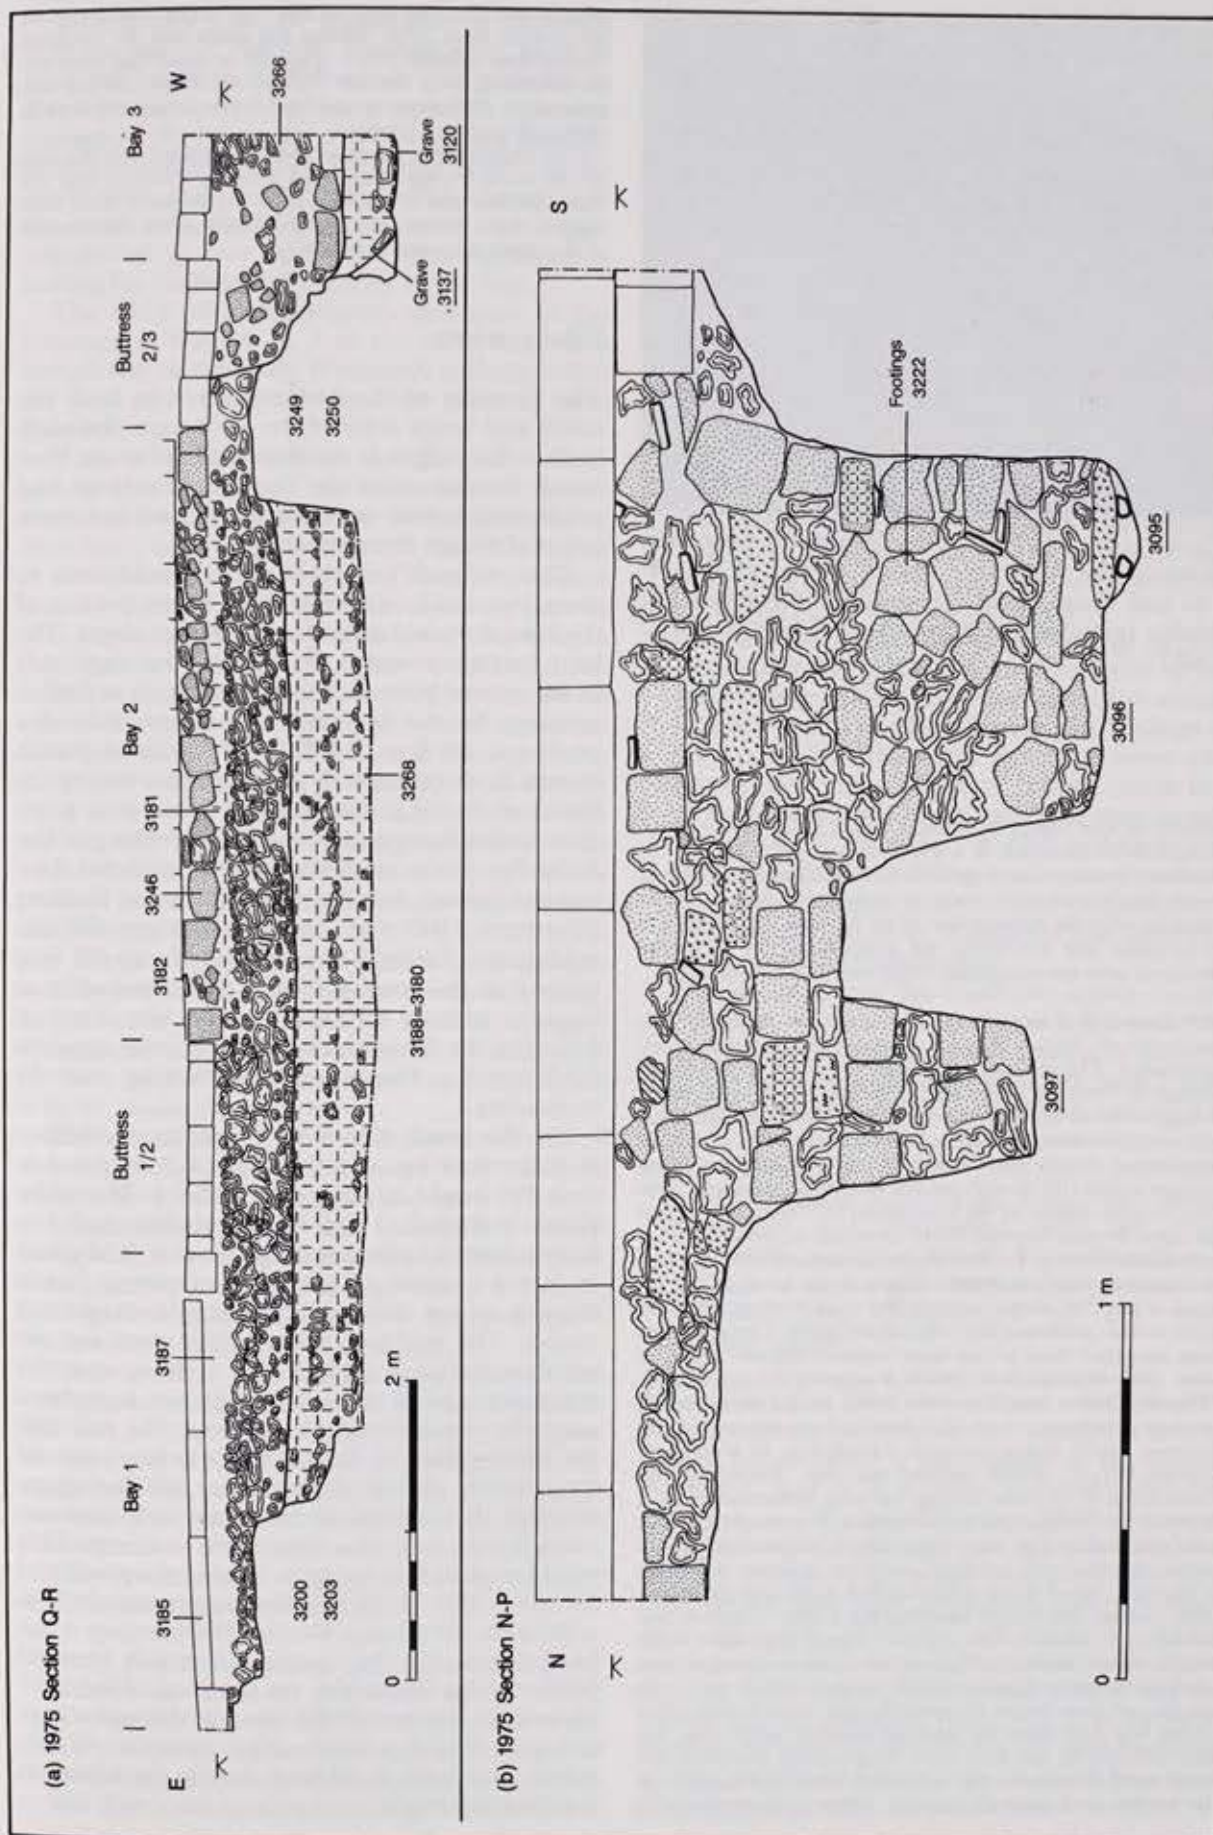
RA 1975: (a) Elevation of footings of north aisle wall, Bays 1 and 2 and part of 3. (b) Elevation of north transept footings showing post-dissolution footing (3222). See Fig 14 for location of sections.
